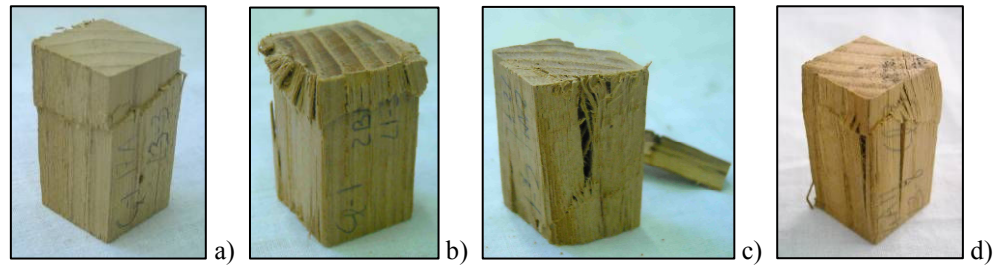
Compression tests parallel to grain on specimens type DF-C_L – Typical collapse mechanisms: a) Shearing; b) Crushing; c) Splitting; d) Crushing and splitting.
